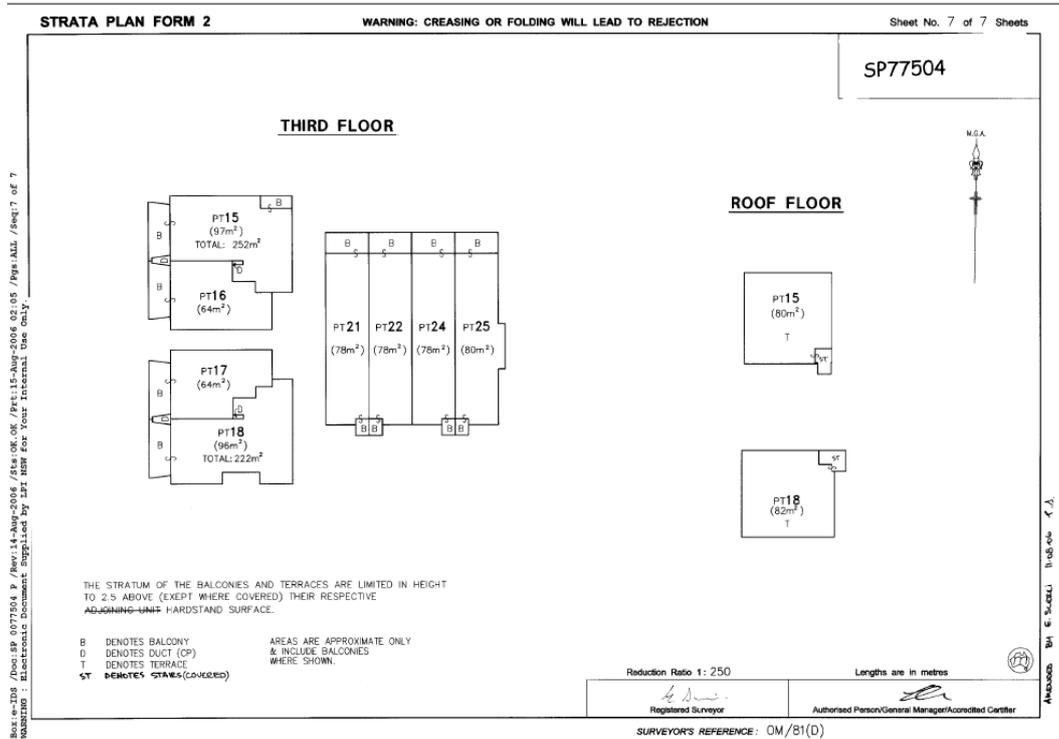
Extract of SP77504 showing the terrace at the roof floor on title (Pt 18)
